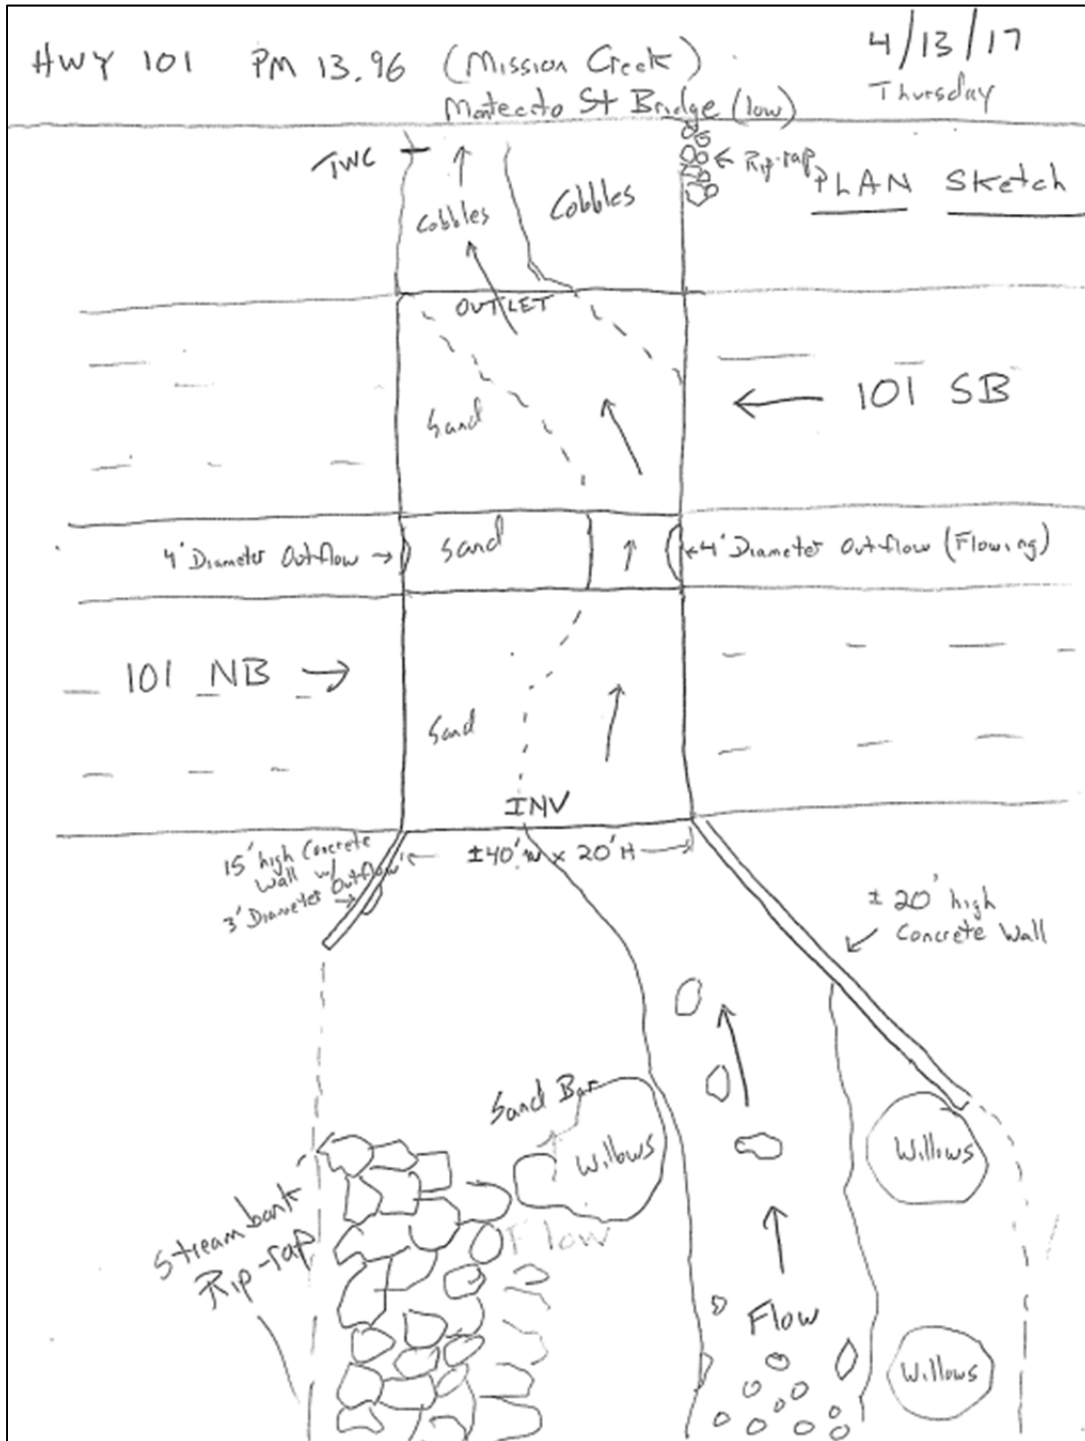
Site sketch for Santa Barbara County, Route 101, PM 13.96.
